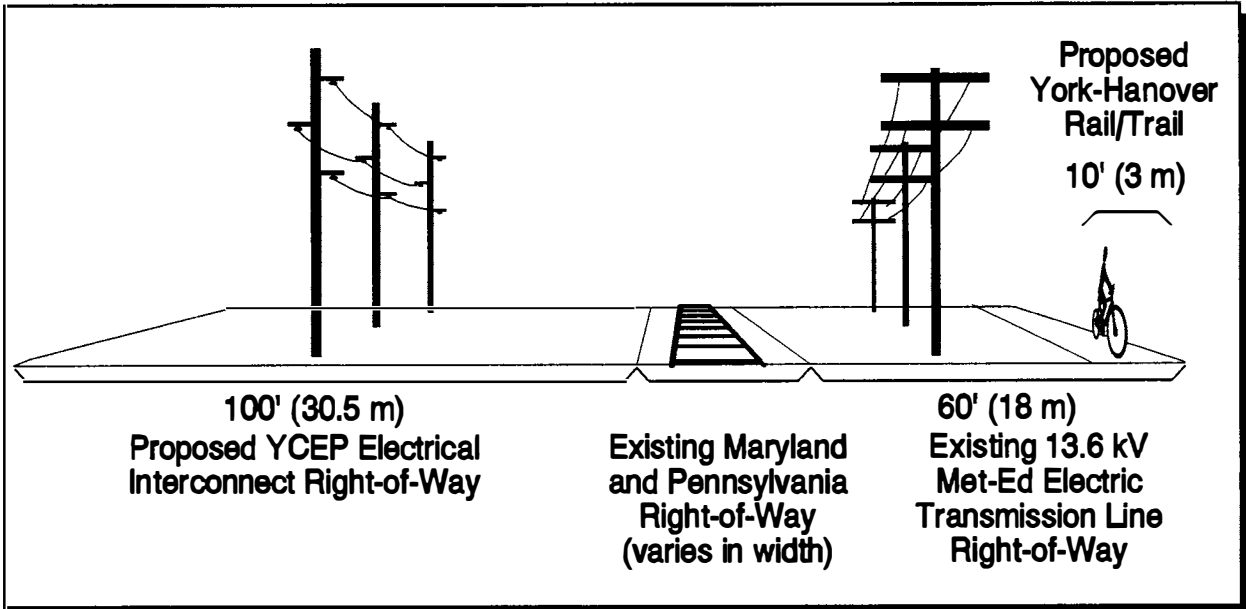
Typical cross-section of proposed utility, rail, and rail/trail corridor.
